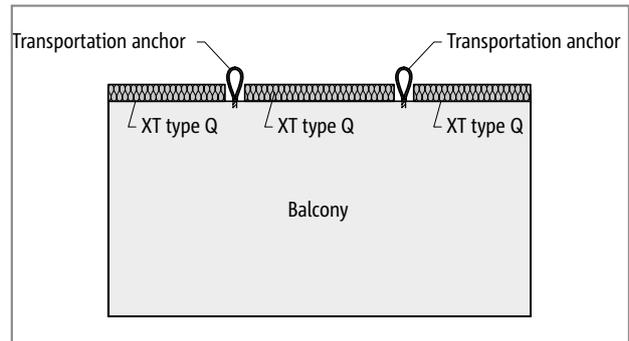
Schöck Isokorb® XT type Q: Precast balcony with transport anchor; insulating adapter XT type Z can be inserted on-site
